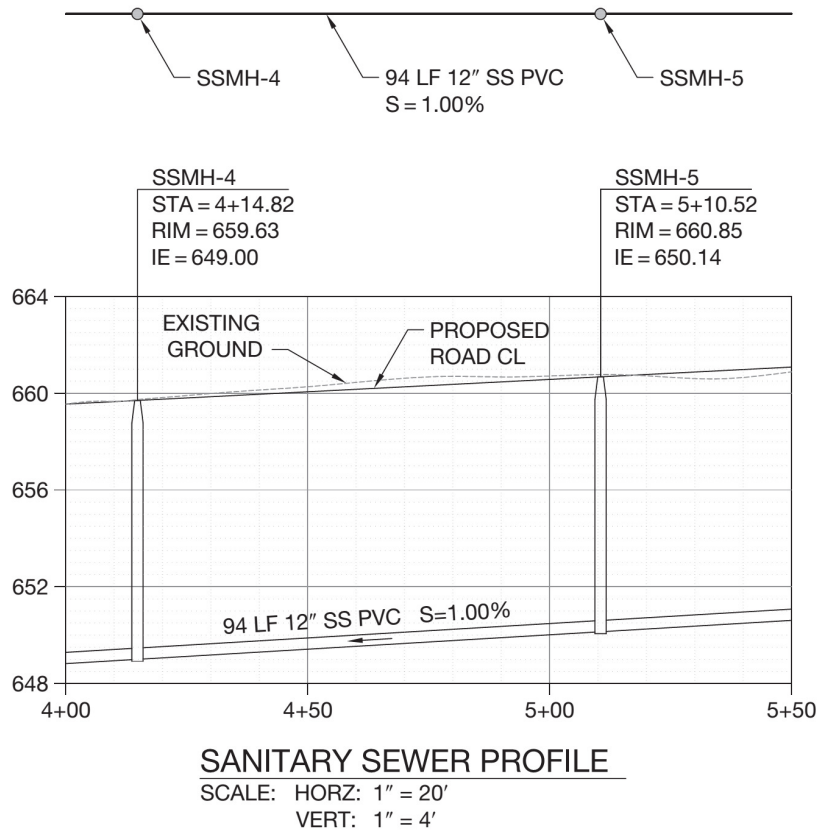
The completed plan and profile drawing of a section of sanitary sewer line.
